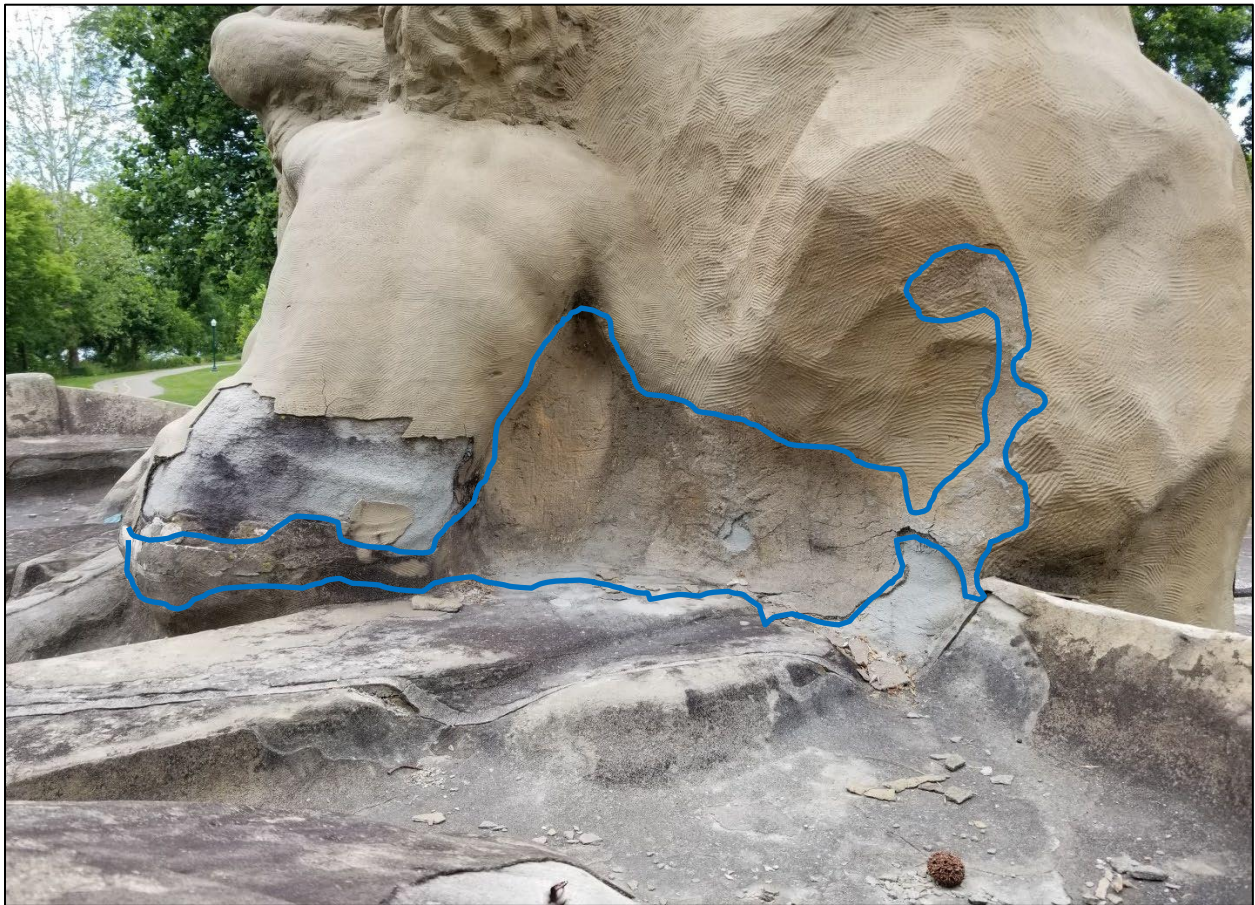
Detail of the intersection of the rear sculpture group with the boat showing the cracking, blistering, and peeling of the surface and previous patch repairs (outlined roughly in blue) indicating this is has been an ongoing problem. The thickness of the stone surface loss at the figure is approximately $\frac{1}{4}$ inch. The previously applied patch repairs are also peeling away because the material was applied too thinly and not mechanically keyed.
